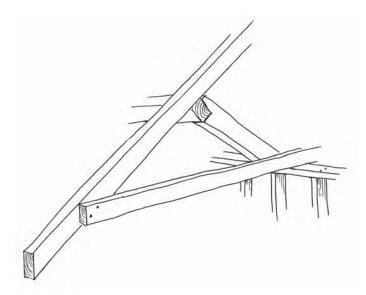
Installation of underpurlin and struts to provide mid-span support of rafters
